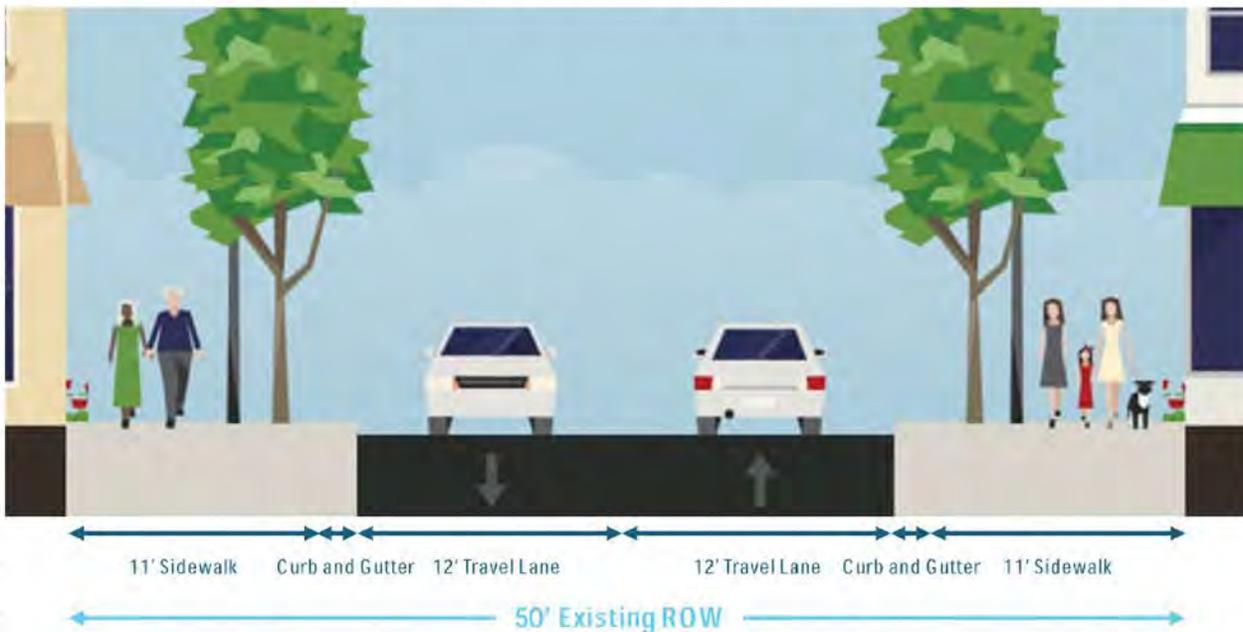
Proposed Cross Section for NE 28th Avenue, south of NE 209th Street
